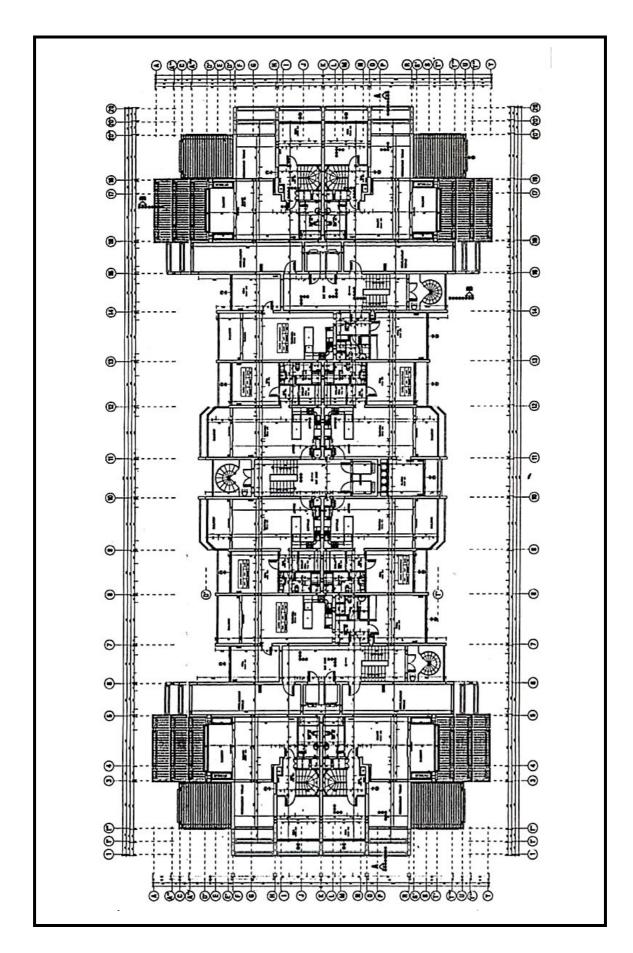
Mavişehir II; Kuğu 20th-Floor Plan
